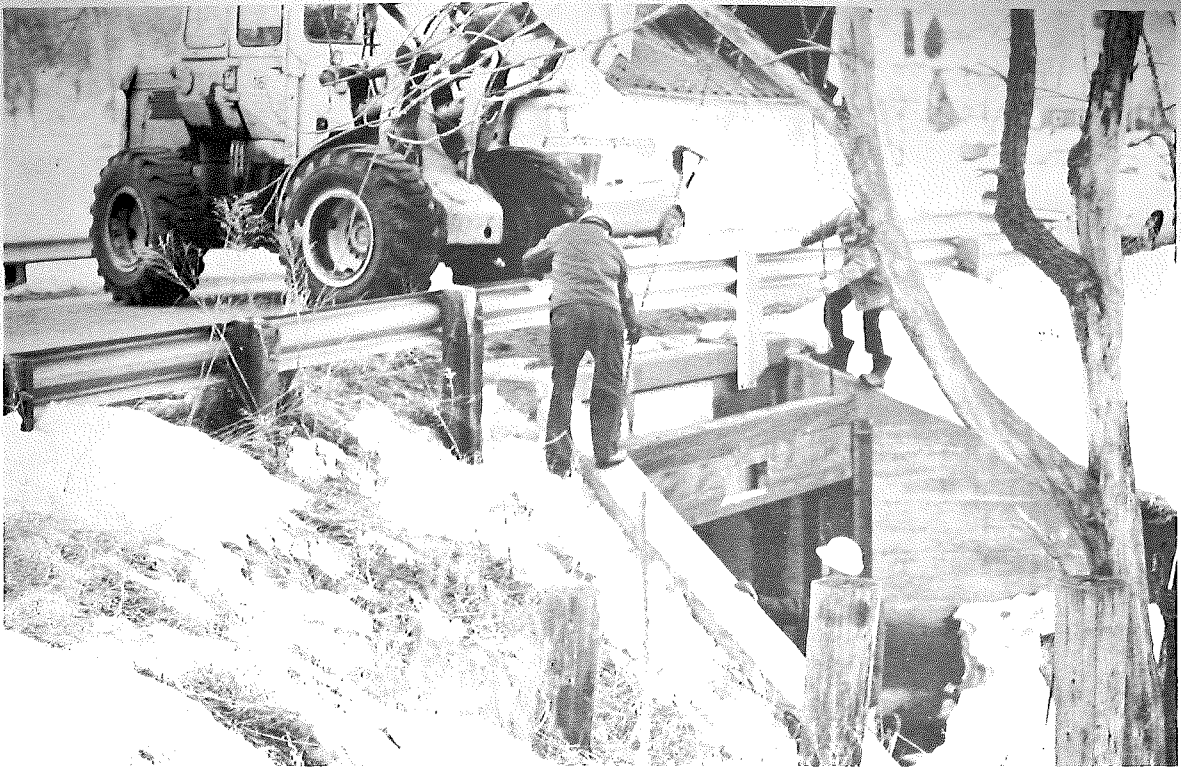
Stop log gate being lowered into place at Boller Lake outlet dam. The rectangular hole in the bottom can be easily opened, thus allowing flow into a fish trap located in the culvert.
